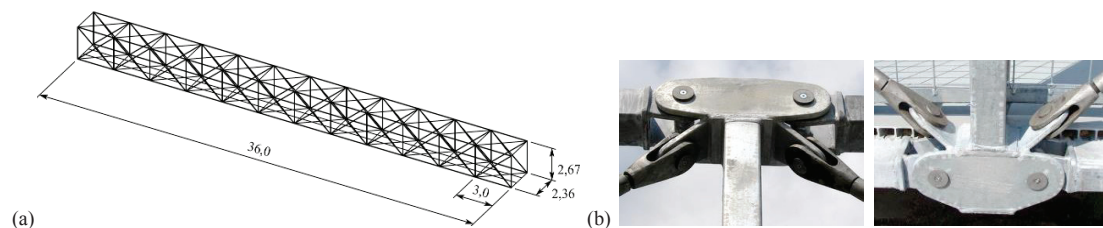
Long footbridge: (a) geometrical composition; (b) typical configuration of assembly connections (upper and lower chords).
